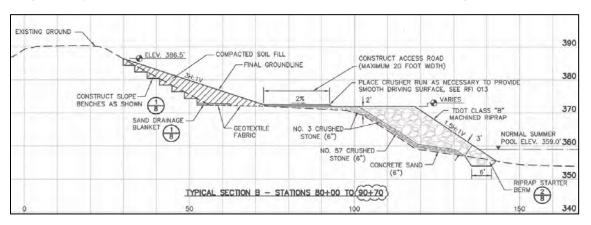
Typical Erosion Protection, Southeast Perimeter Dike (Drawing No. 10W550-08)
